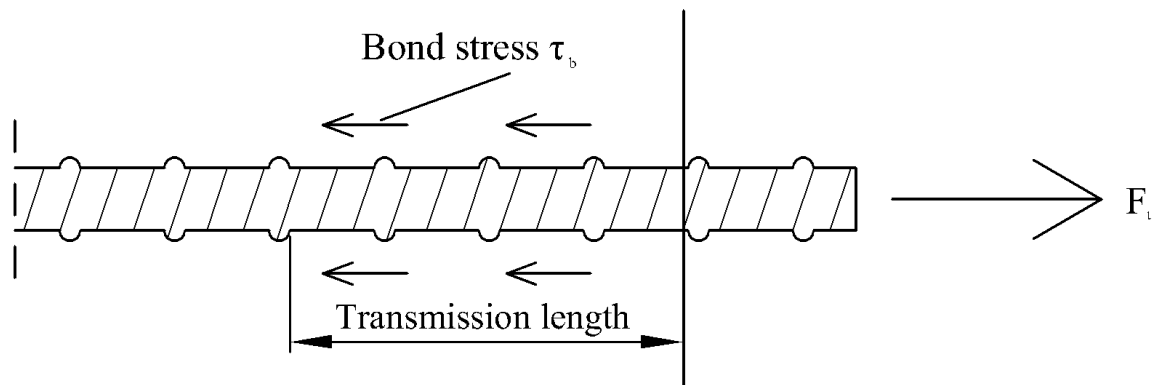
Transfer of force between a reinforcing bar and concrete
